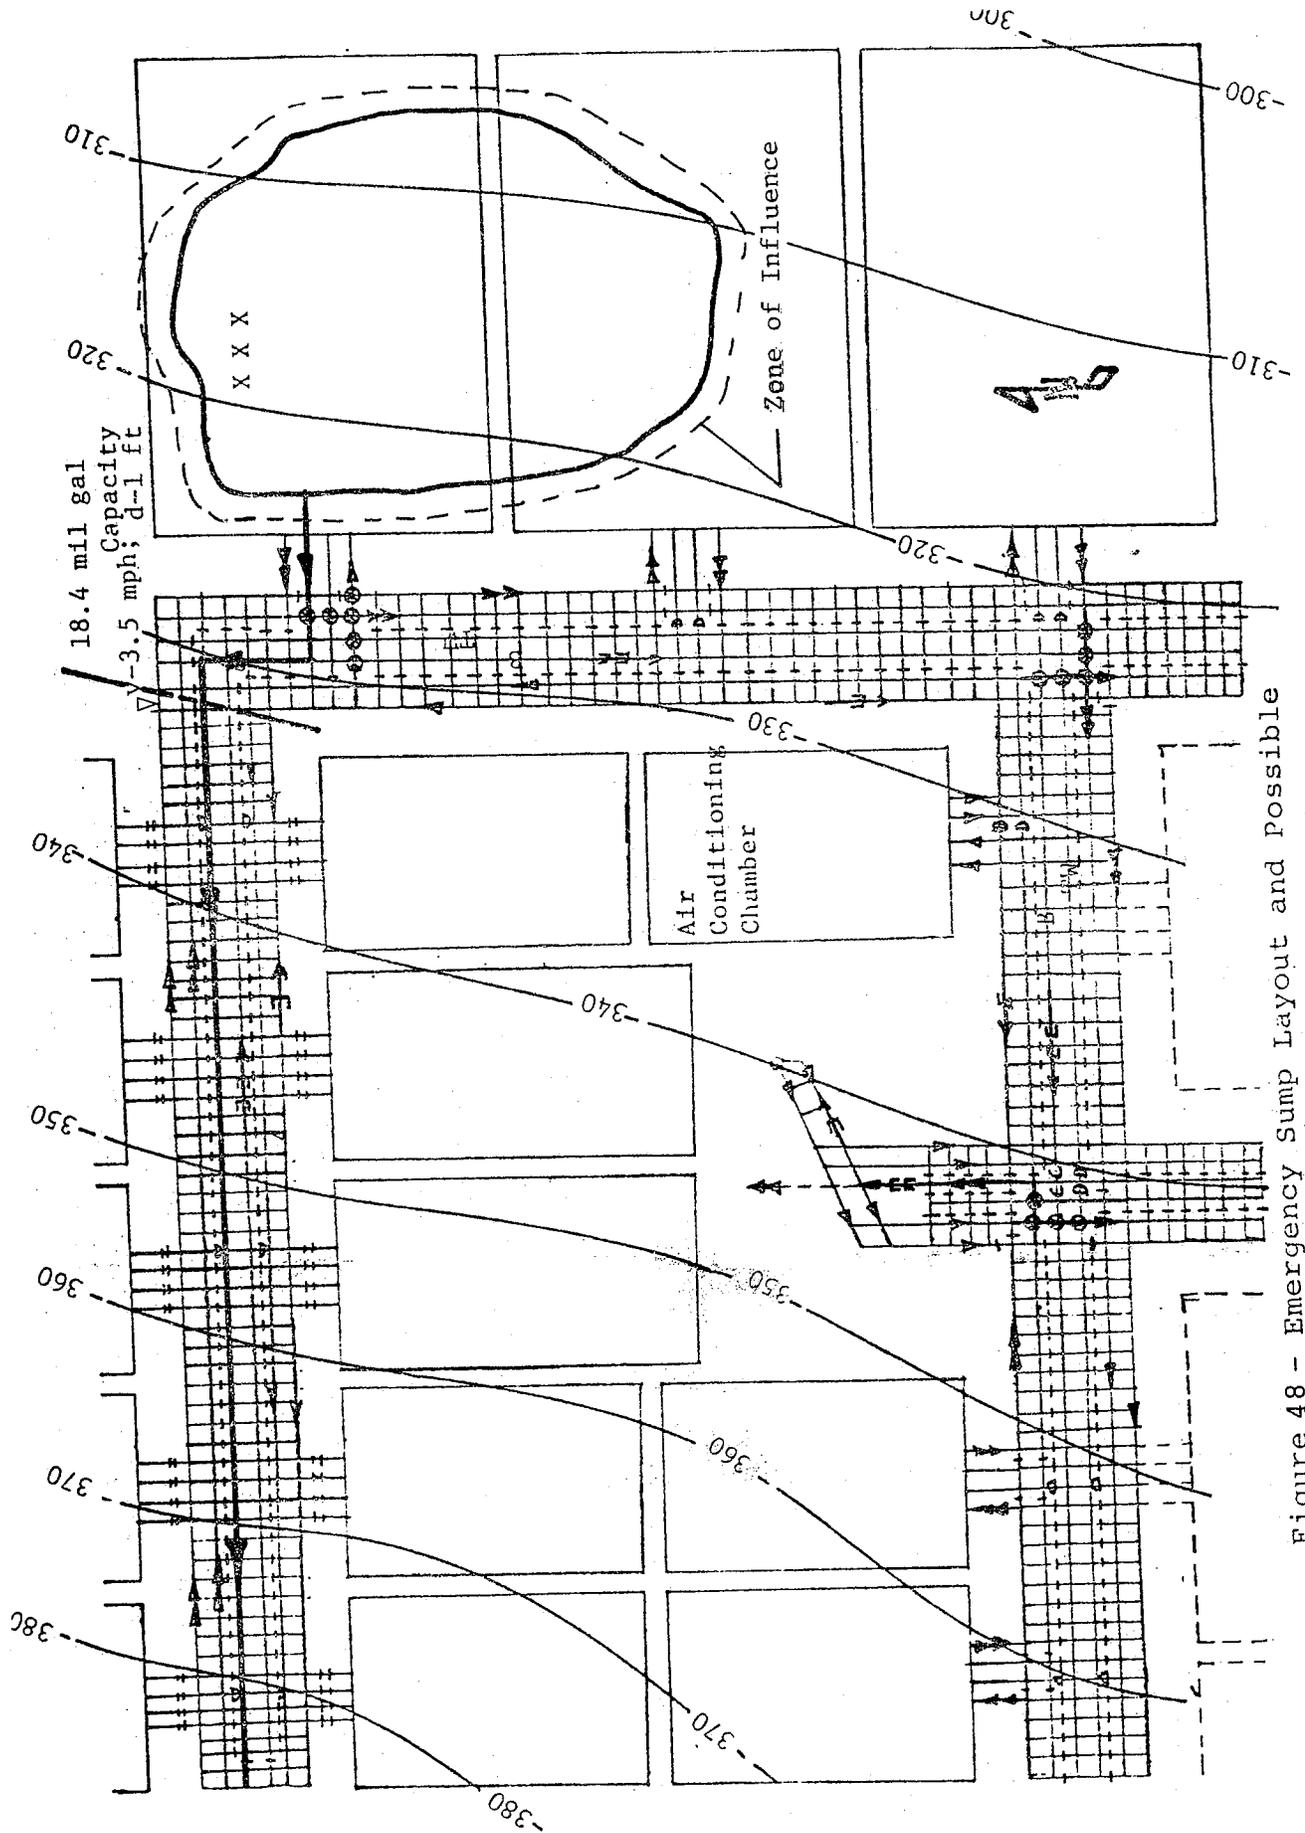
Emergency Sump Layout and Possible Flow Routes
